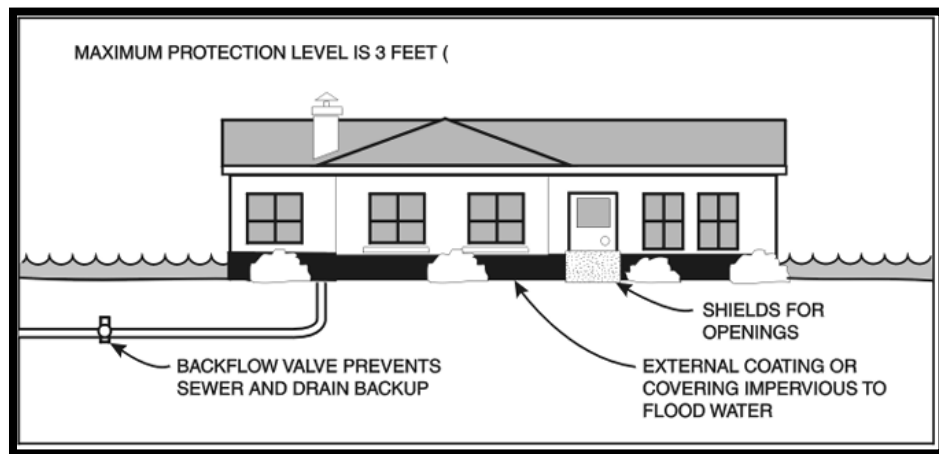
Depiction of Dry Floodproofing (FEMA 551, 2007)
